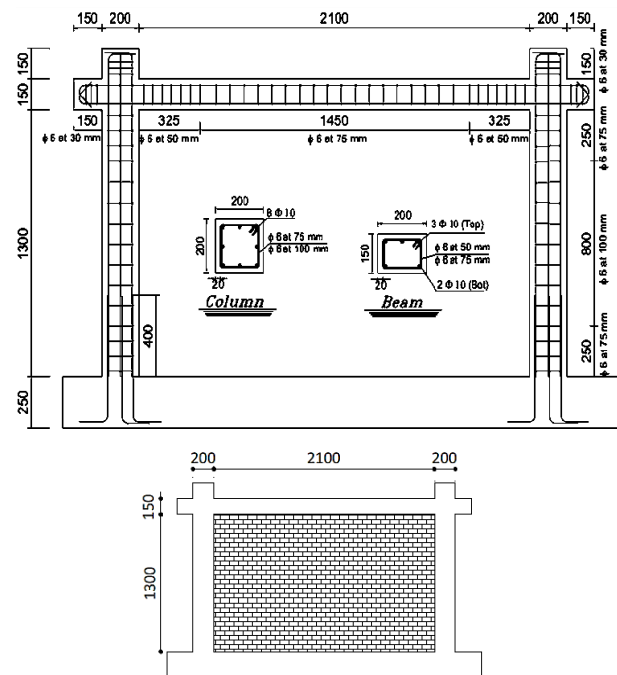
Geometry and reinforcing details of reinforced concrete frame and infill-frame masonry (dimensions in millimeters) [32]
